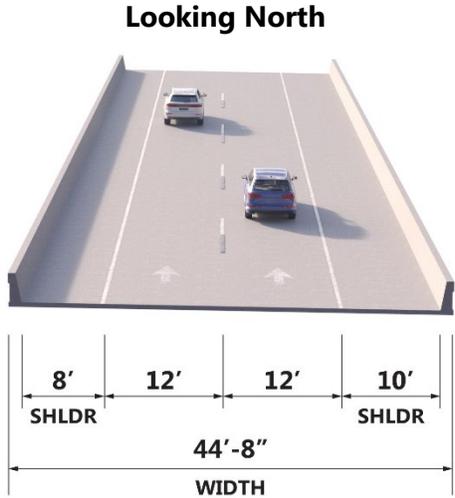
Proposed Southbound US 41 Bridge over SR 597 (N. Dale Mabry Highway) Typical Section
